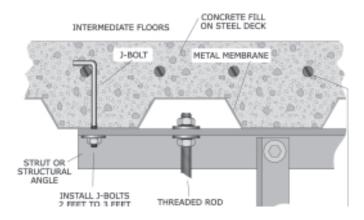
Cast-in-place anchor; concrete fill on steel deck.
